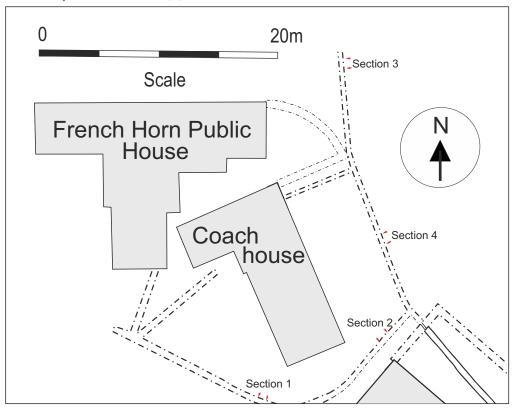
Sections and location plan for northern part of service trenches (sections 1-3)
